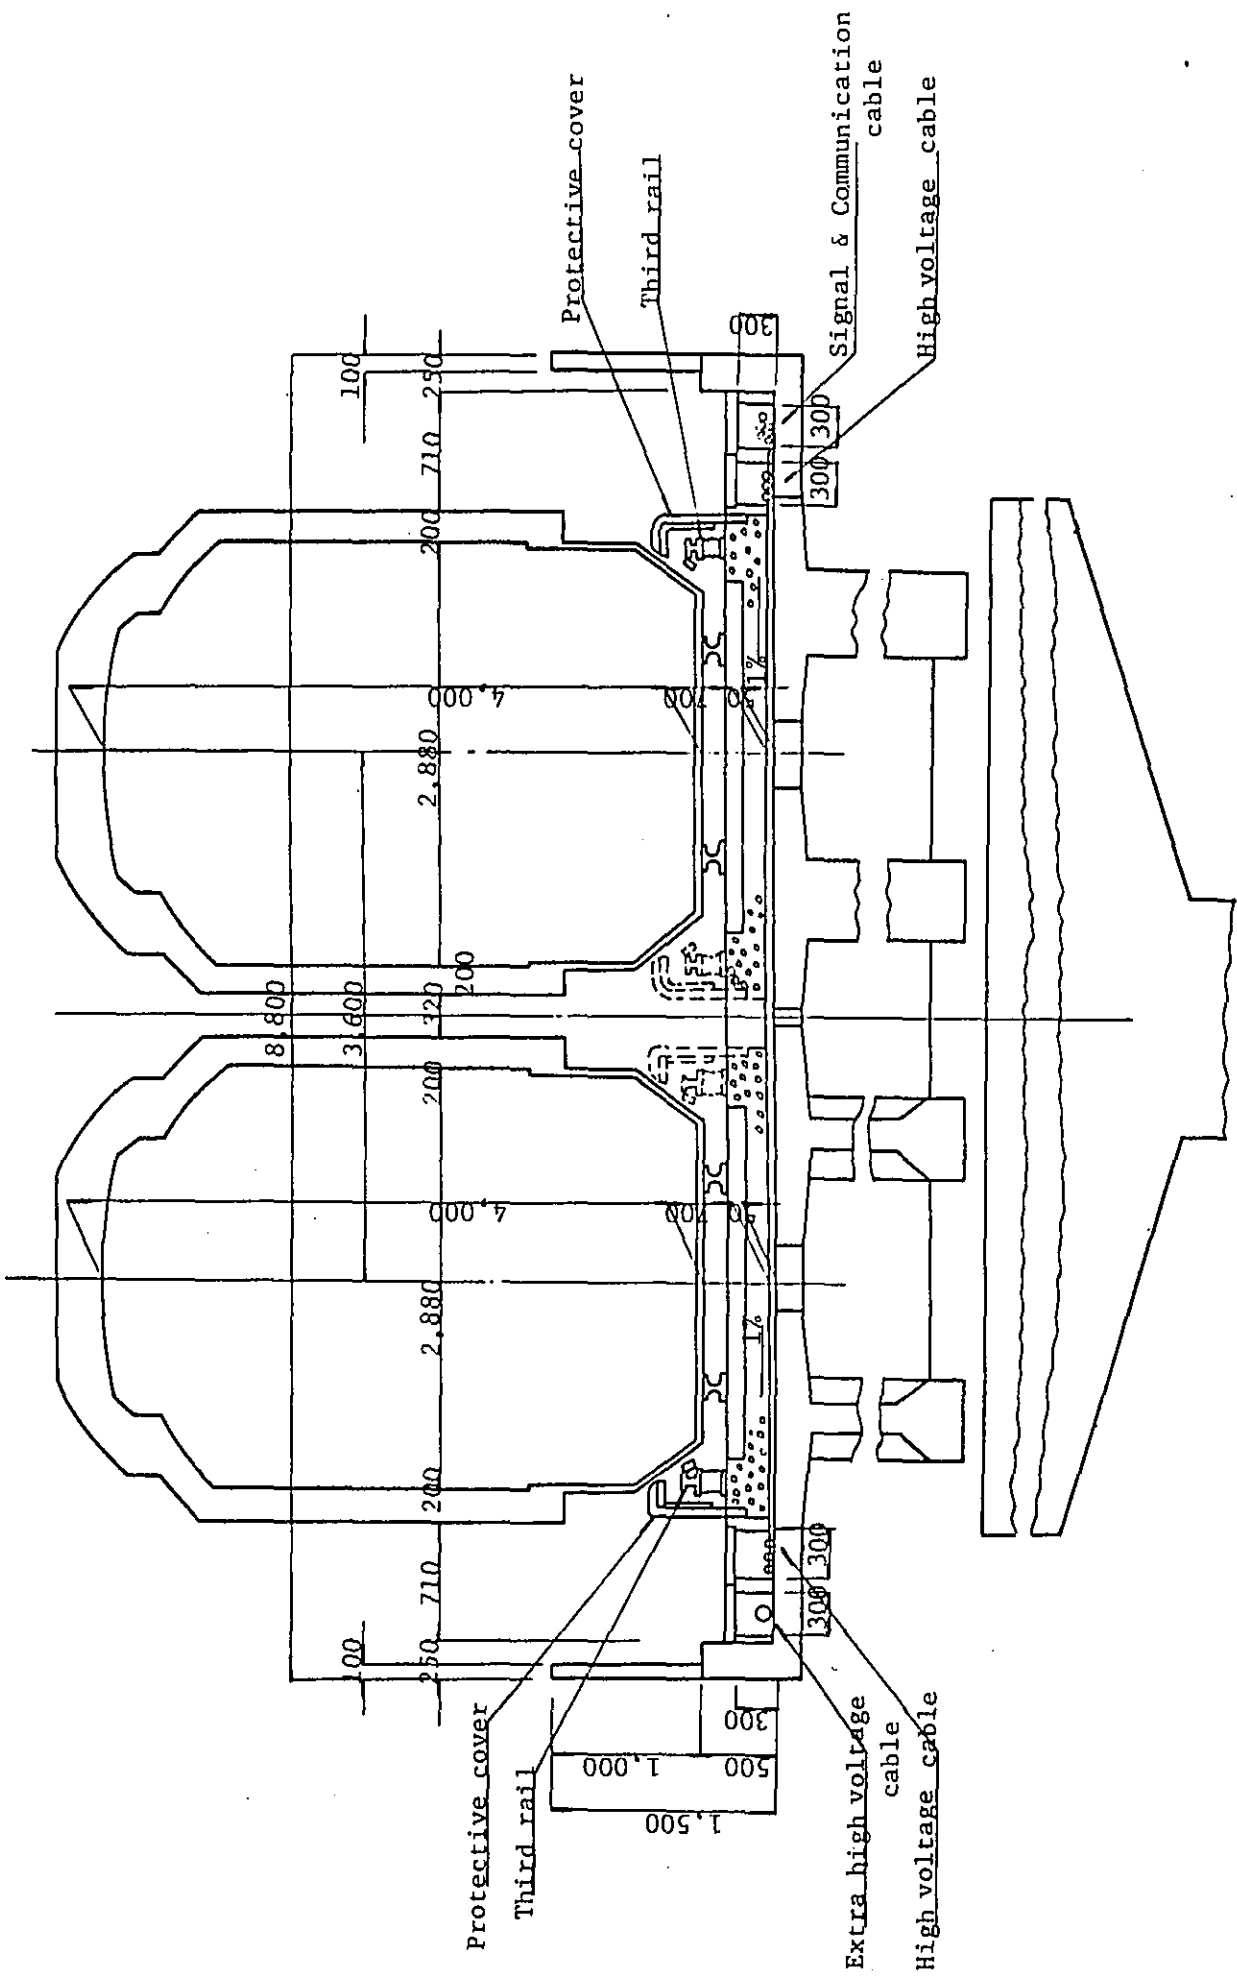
Wayside Cable Layout of Line No. 1 (Elevated Section)
